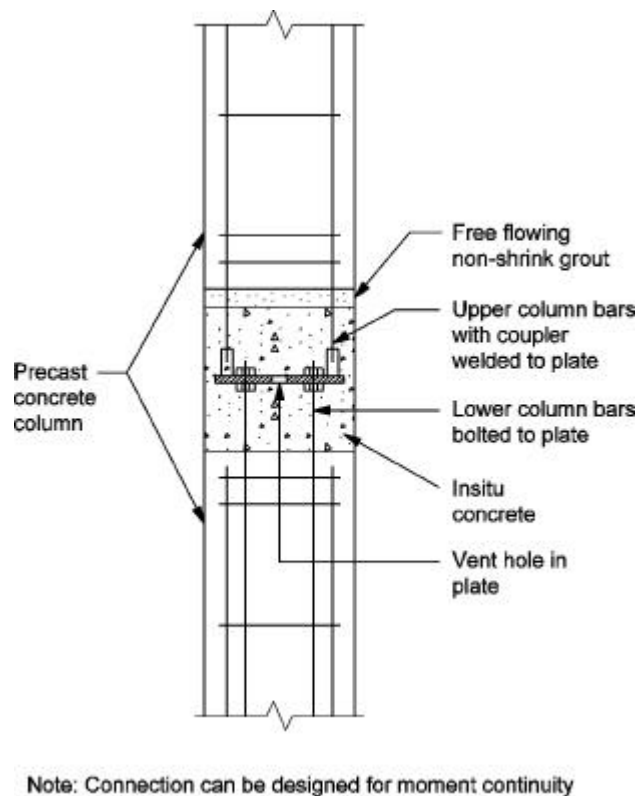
Column splice using combined welded and bolted connection
